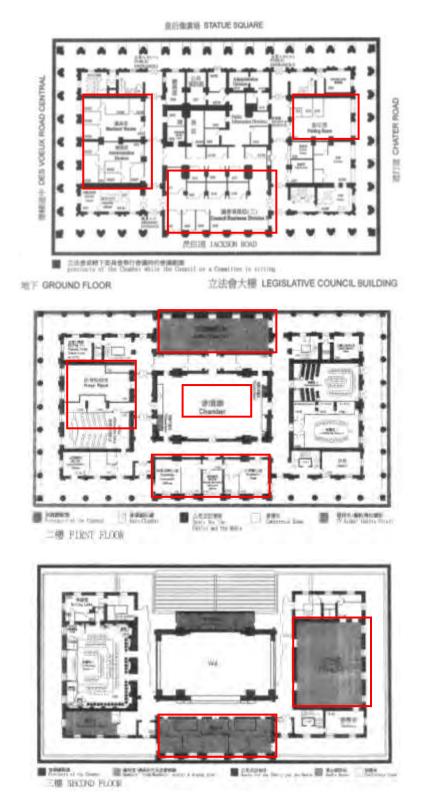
77 (Top to bottom) Floor plans showing the locations of existing timber strip flooring discovered in each floor after the carpet removal in Mar 2012.
